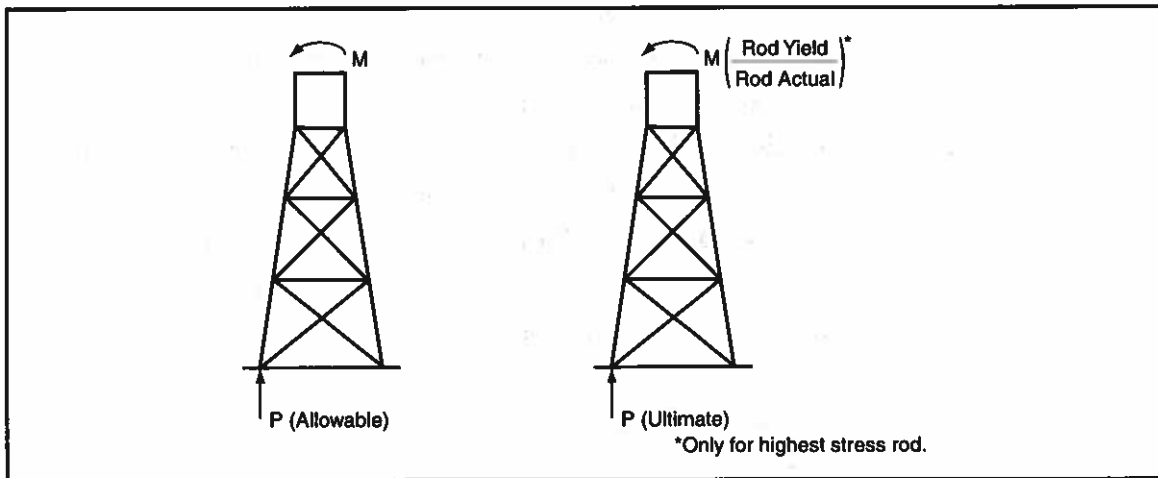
Diagram for checking foundation stability of cross-braced, column-supported elevated tanks
